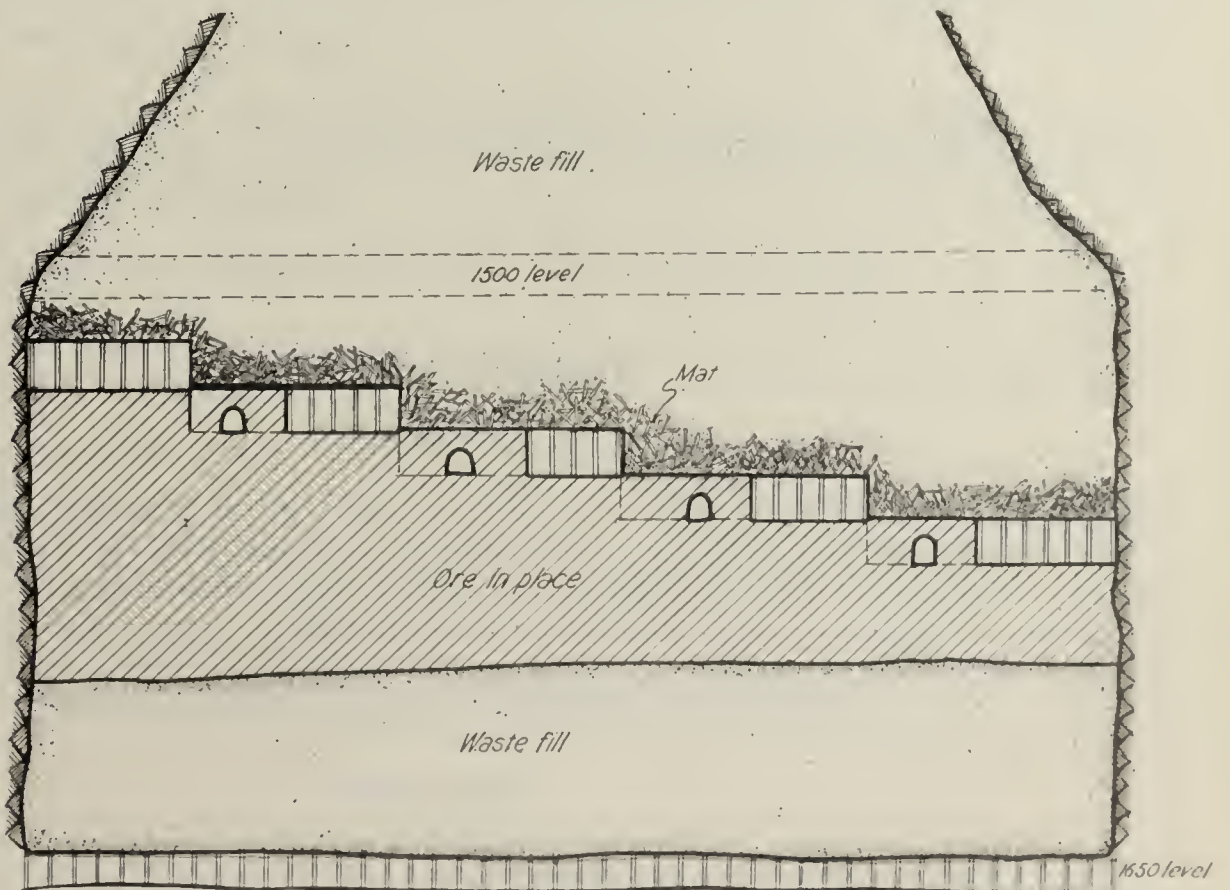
Vertical section through No. 2 top slice stope, section A-B
